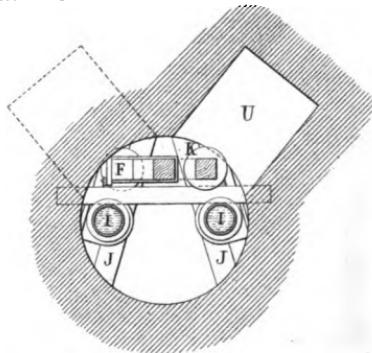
Sectional Plan of Pit at Gland of Plunger Pump.
